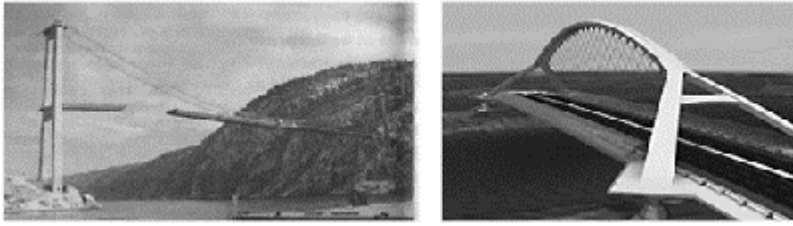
Fedafjord Bridge (Norway, 2006) and Zaragossa Bridge (Spain, 2007).
